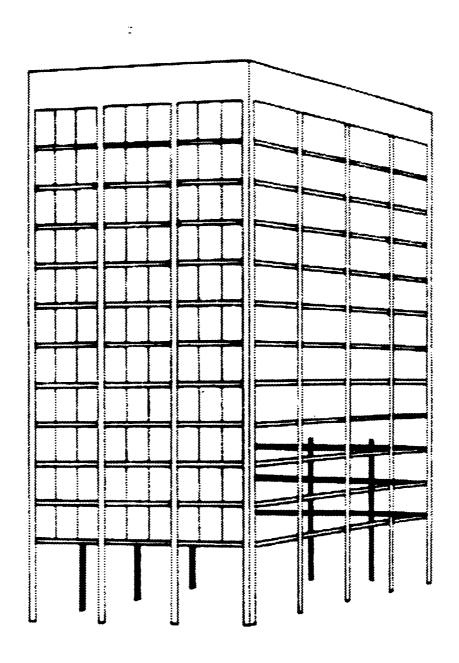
Typical Framed, Light Clad, Glass Exterior Building. In this example, the building height would be calculated at 12 stories.
